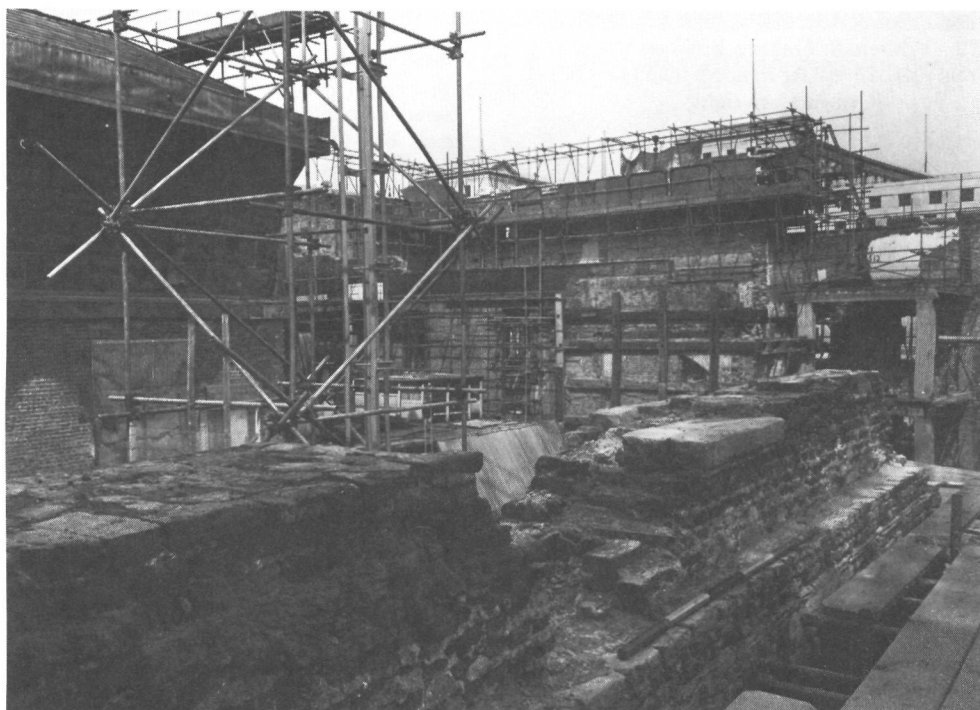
Whitehall: Gallery between the tennis plays; view looking north-east at roof level, showing top of north wall of gallery with the Great Close Tennis Play in the background (Crown Copyright)
